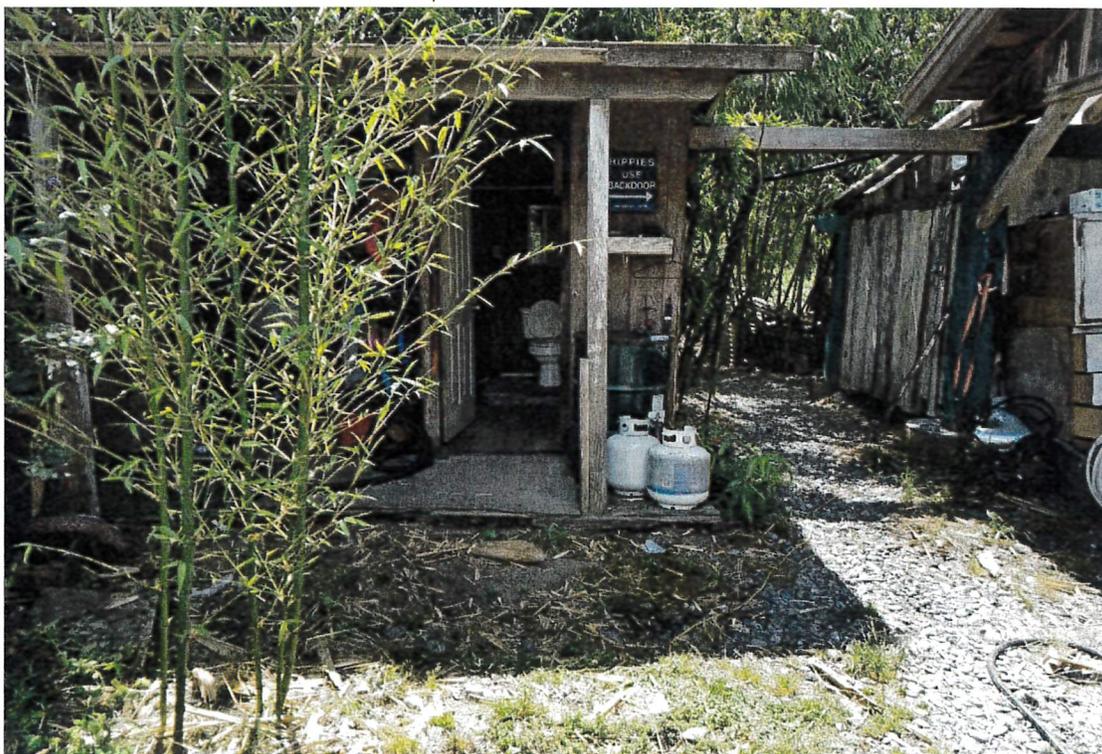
Flush toilet outhouse with underground plumbing to a nearby septic tank with two (2) 75' long leach lines.
